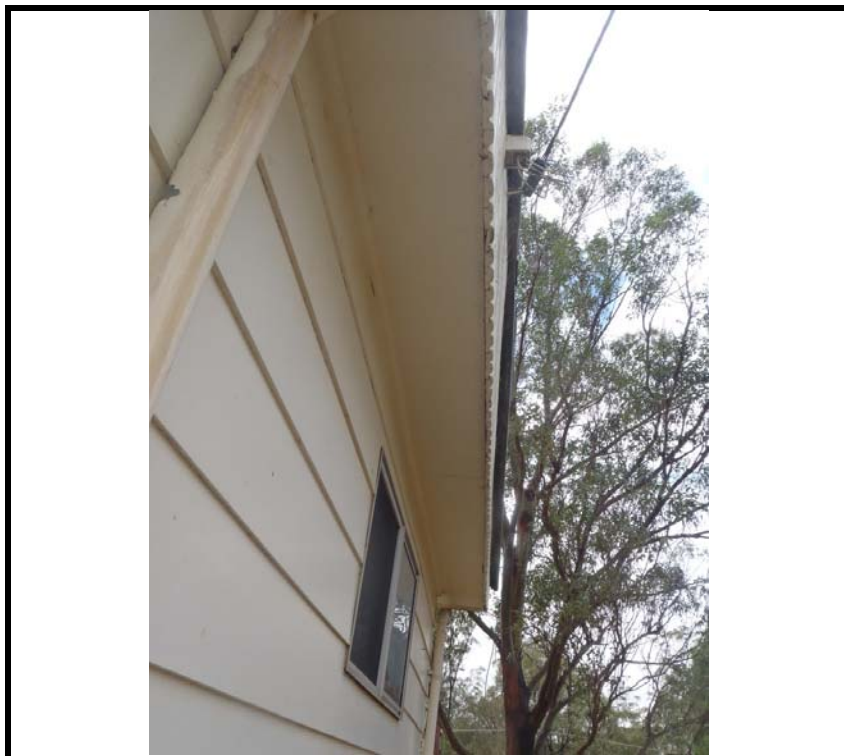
18 Bowditch Avenue - Example of ACM sheeting on exterior wall lining to the northern chicken shed
